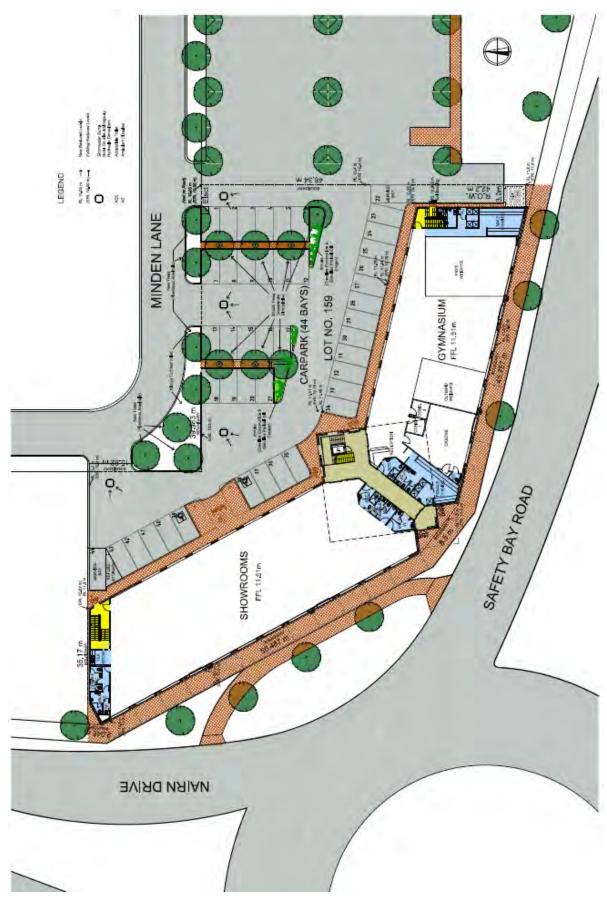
Original Site and Ground Floor Plan (20.8.14)
